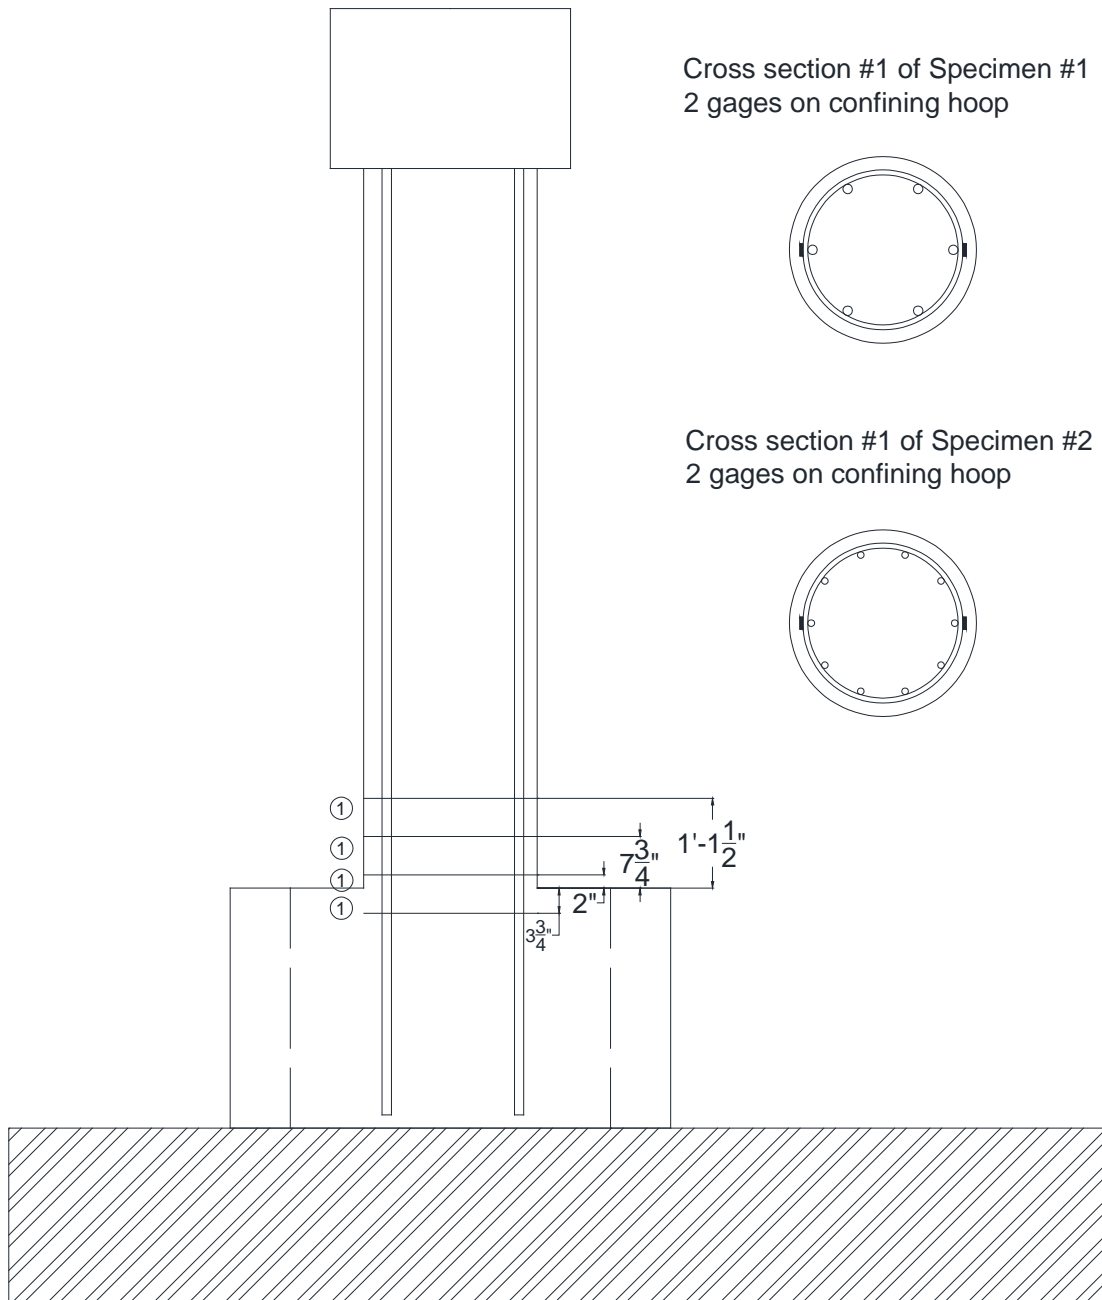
Strain gages on steel hoops of Specimens #1 and #2
